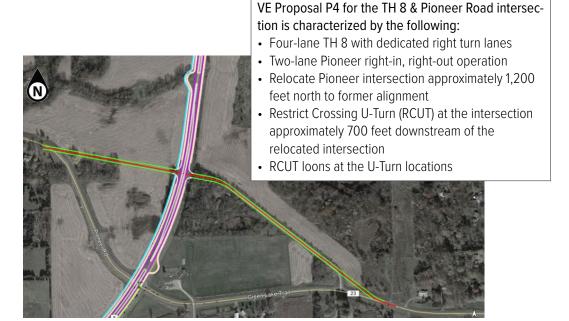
VE Proposal P4 - TH 8 & Pioneer Road intersection
